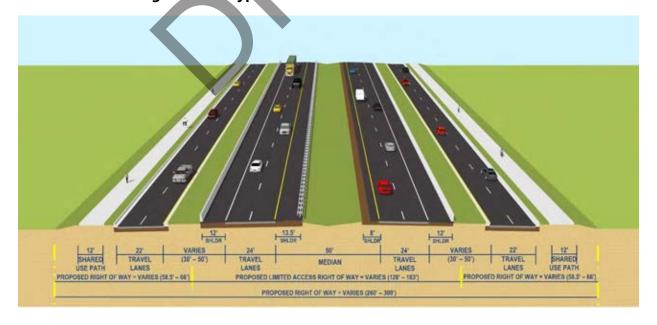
Typical Section – Alternative 1: Co-located
